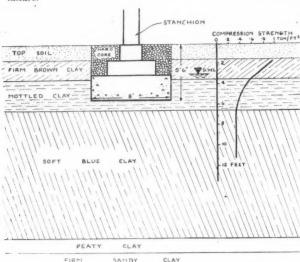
Soil conditions at the site of a footing failure.
